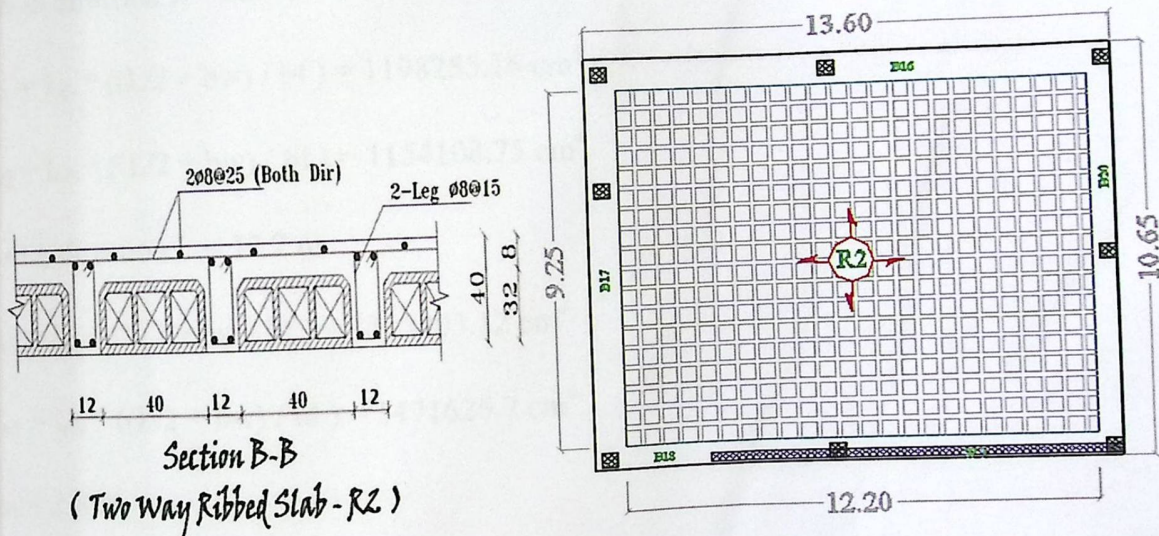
Plan and Section in Two Way Ribbed Slab (R2)
